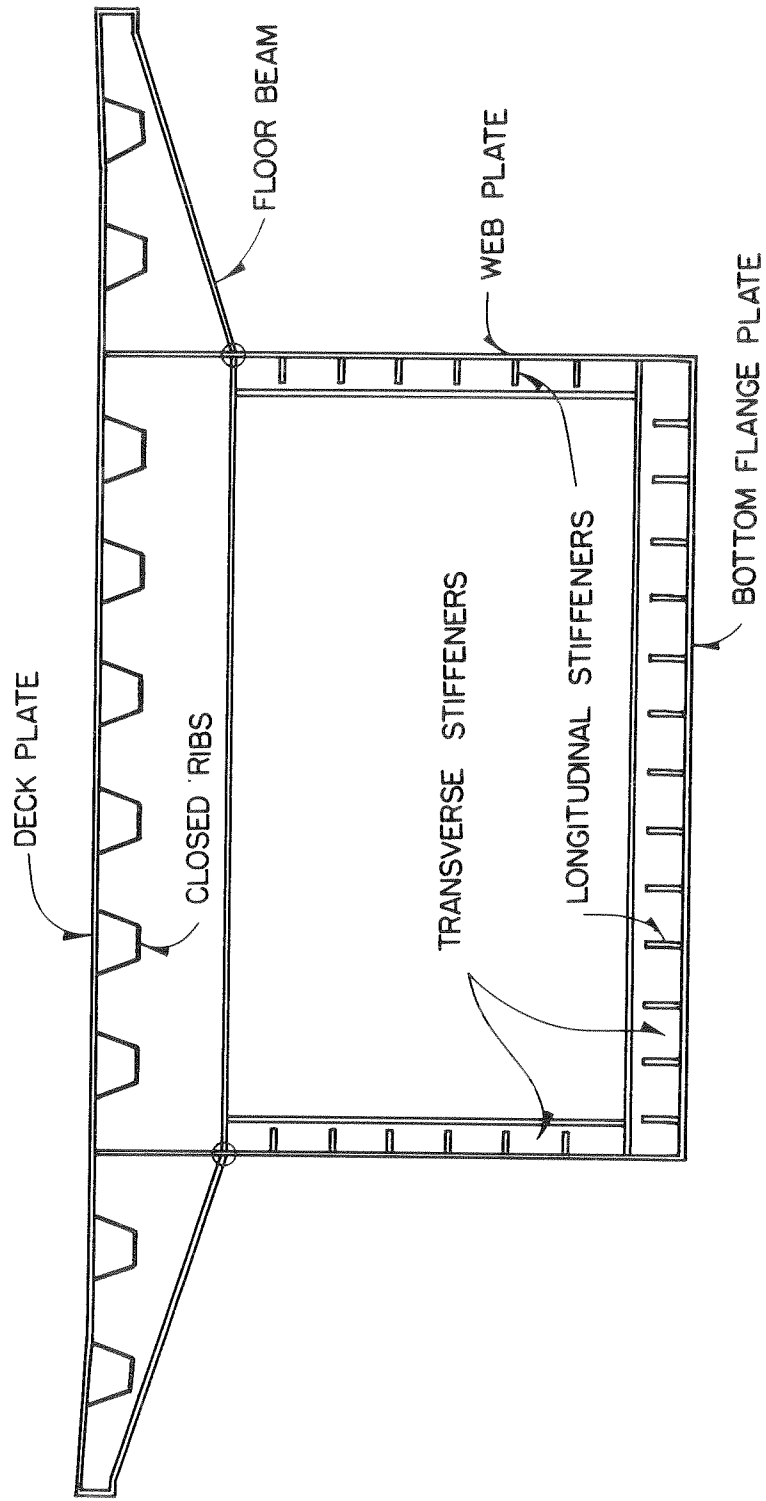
TYPICAL CROSS-SECTION OF ORTHOTROPIC STEEL DECK BRIDGE
